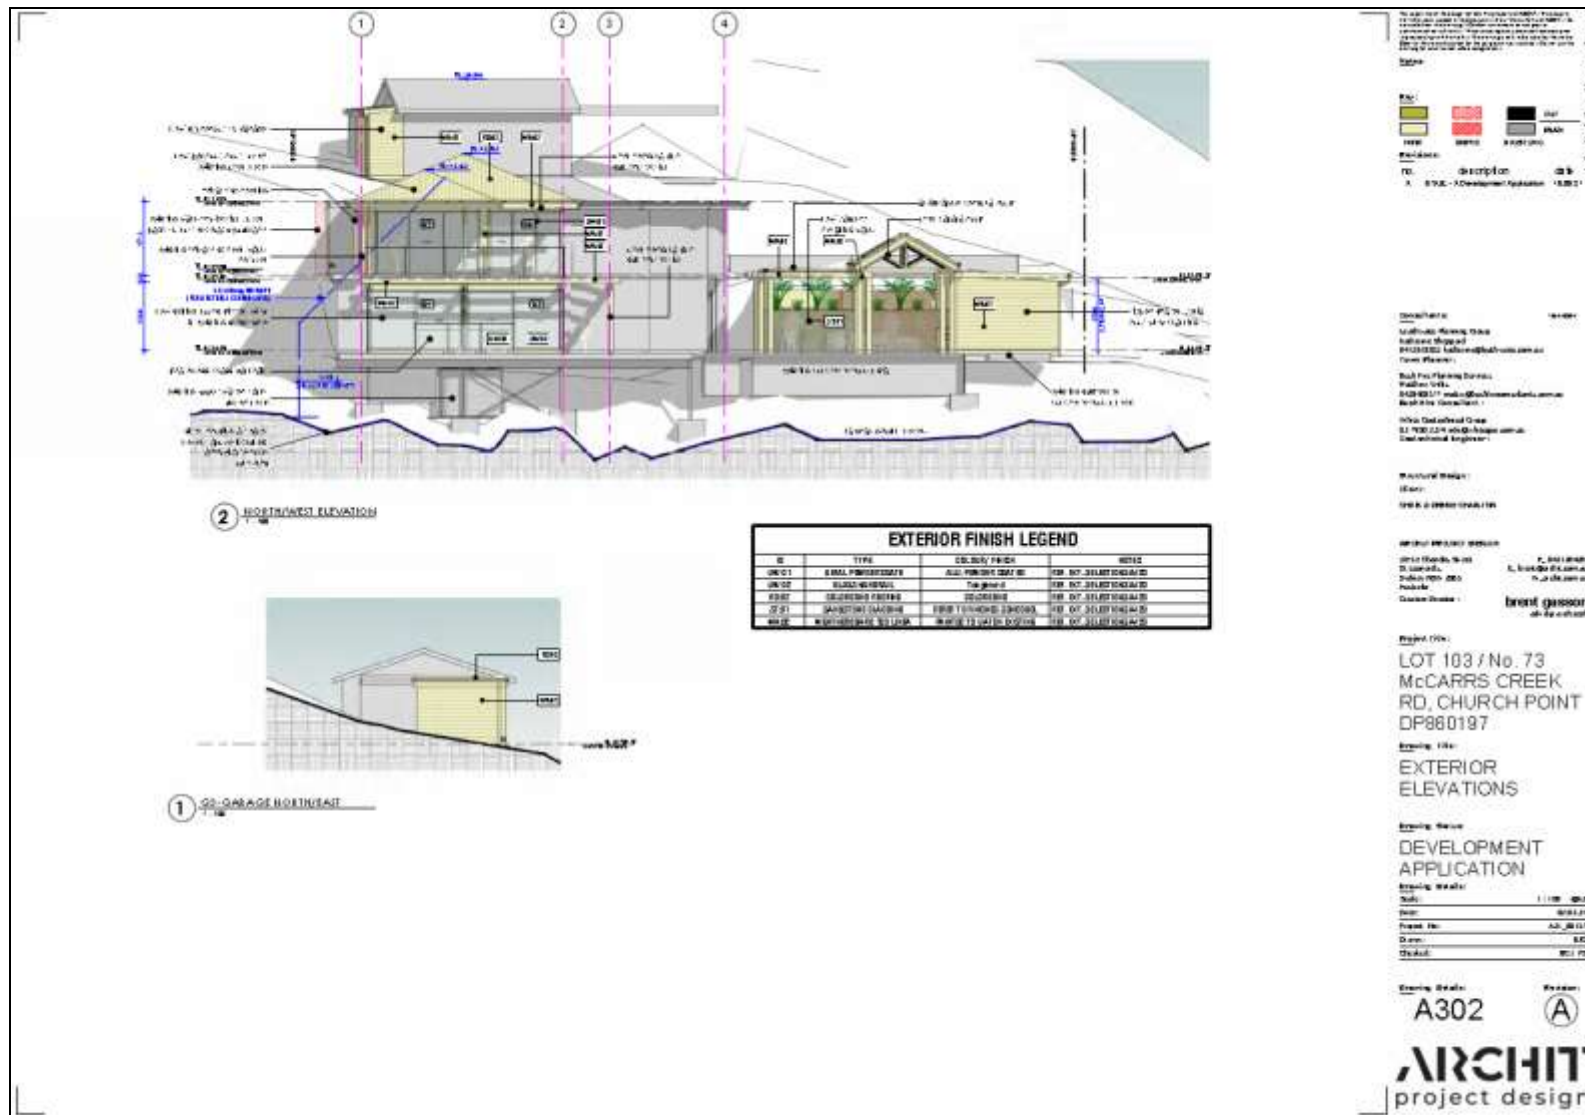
Page 10, Site Plan, Page 1 Landscape Concept Plan, Page 12, Page 13 Ground Floor Plans, Pages 13 & 14 Elevations.
